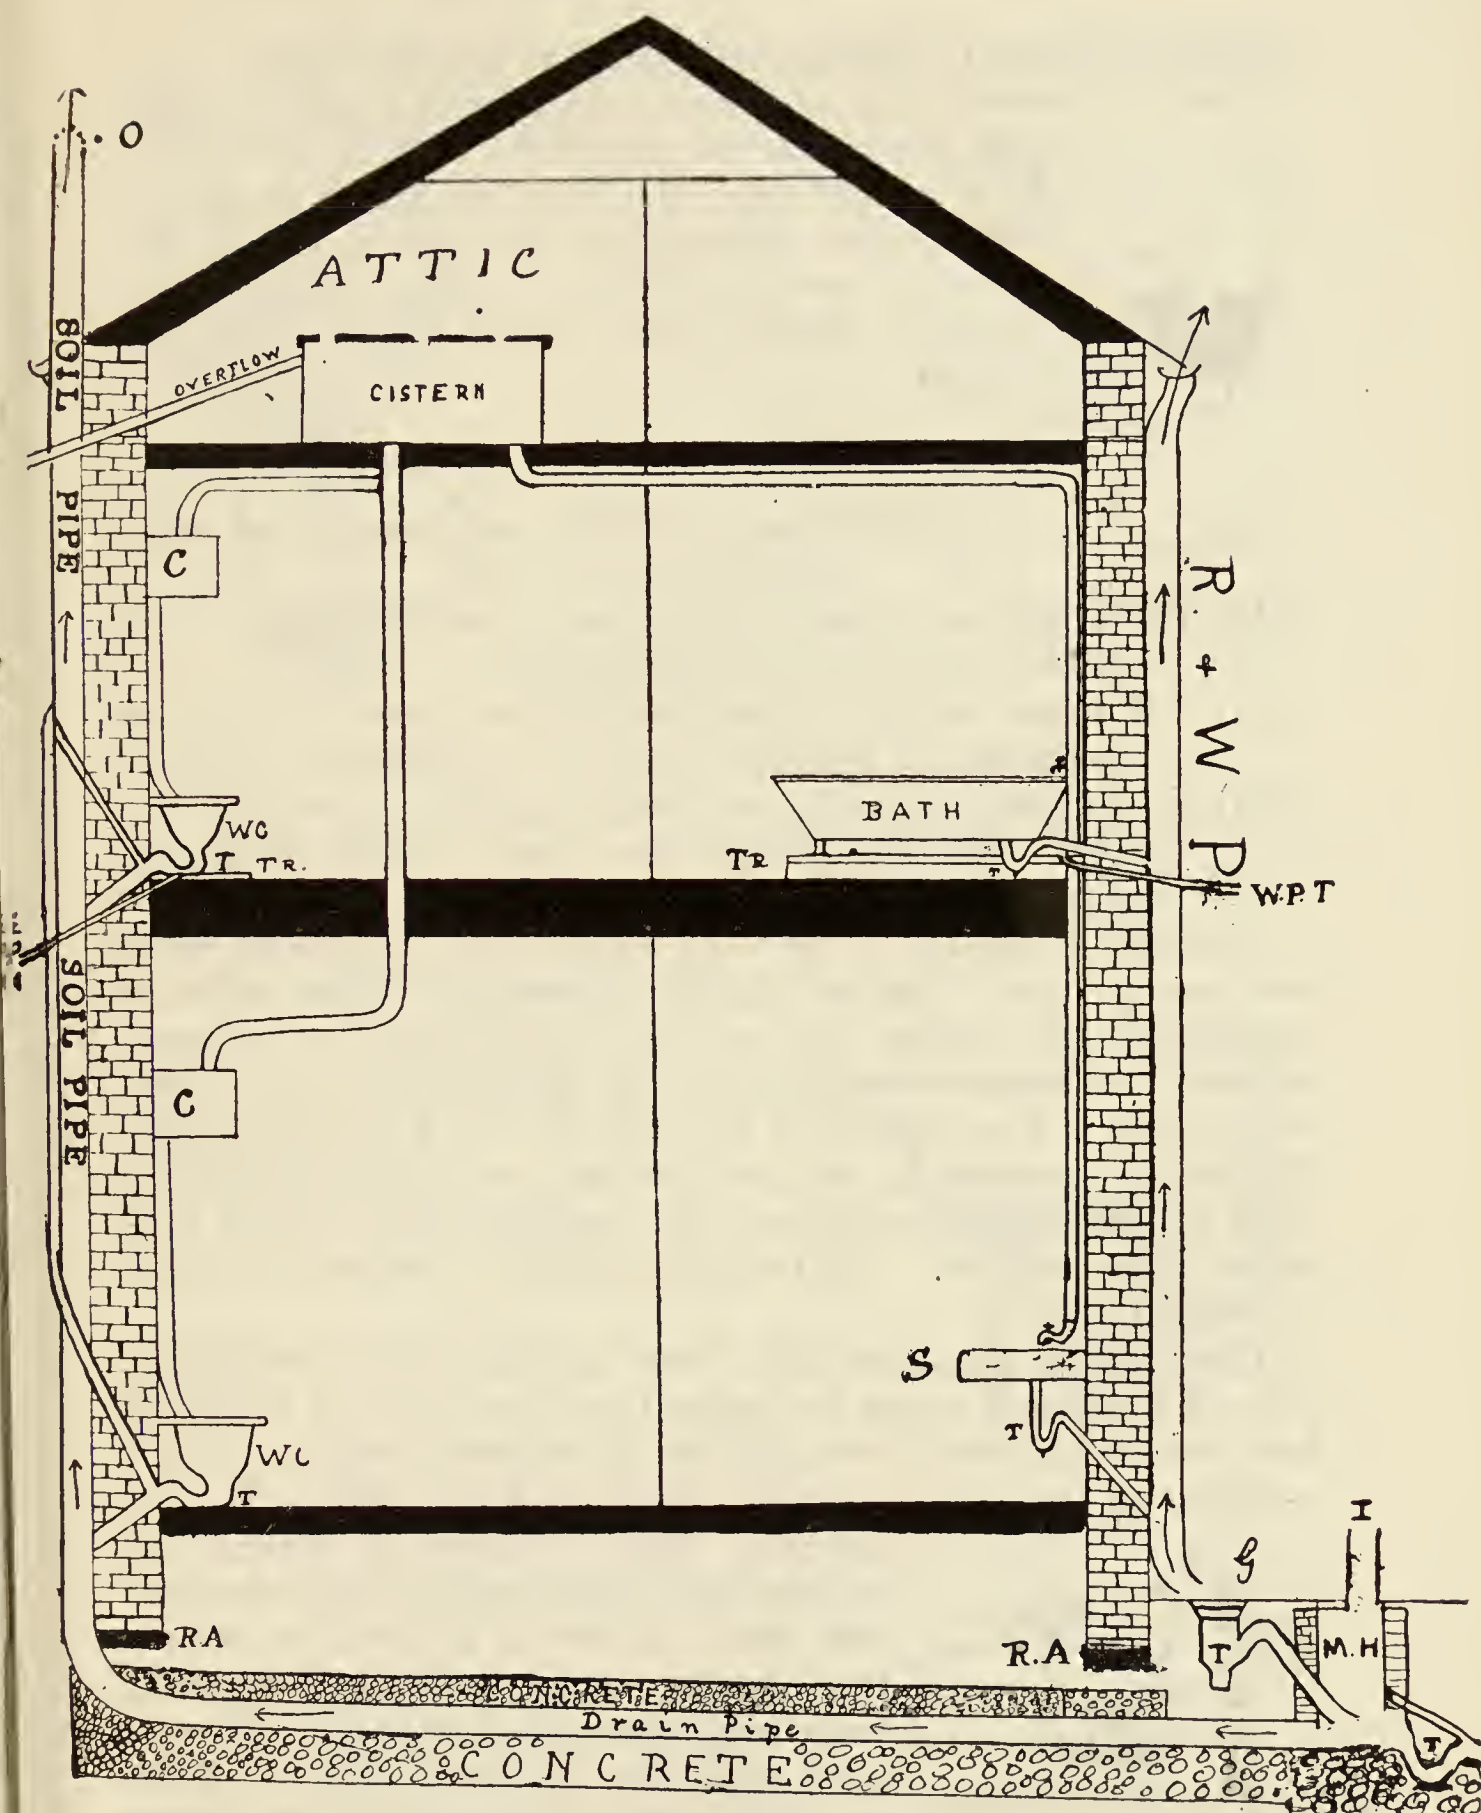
Diagram of house drainage; cistern placed in attic, not inaccessible place in roof, and supplied with ventilated cover and overflow pipe to outside. C C=small cisterns for water-closet flushing. W C=water-closet. T=trap. TR=save-all tray. W P T=wash-pipe from tray. R and W P=rain and waste-pipe from bath and kitchen sink. S=sink. G=trapped gulley. M H=inspection chamber. I=inlet of fresh air to drain. O=outlet (upper end of soil pipe). R A=relieving arch at point where house drain passes under house wall. Arrows indicate direction of air current in drain, soil, and waste pipes.
